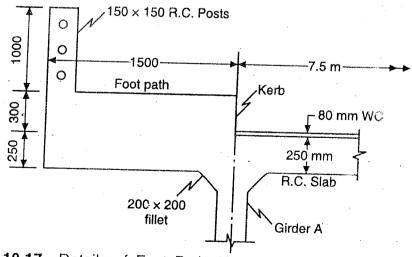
Details of Foot Path, Kerb, Parapet and Deck Slab.
